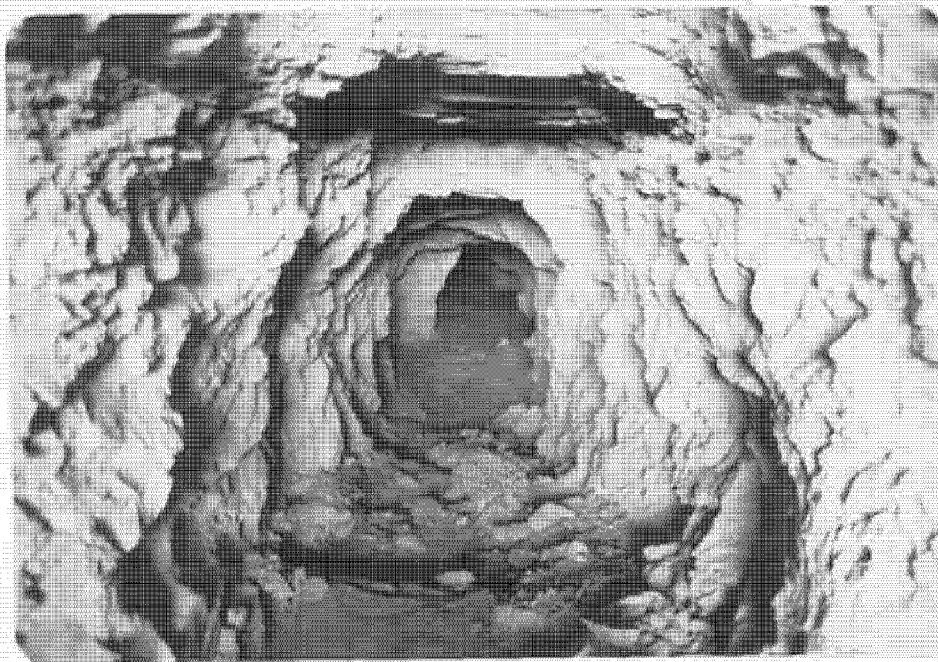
Photo D - Looking west at pit leading to northern adit portal. Timbered entrance to adit is 4 feet high.
